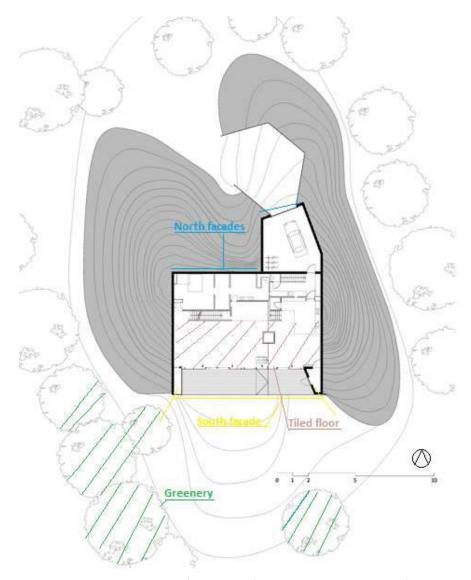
First floor plan. (Denievwegeneratie 2012)
